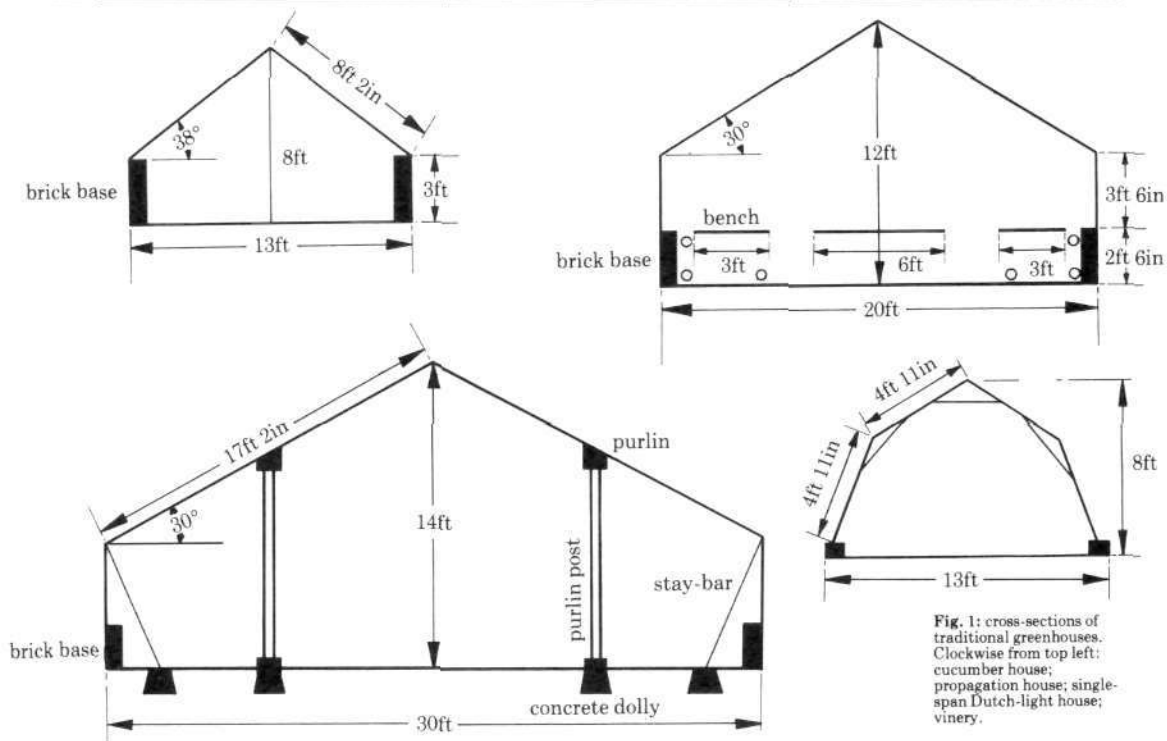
cross-sections of traditional greenhouses. Clockwise from top left: cucumber house; propagation house; single-span Dutch-light house; vinery.
